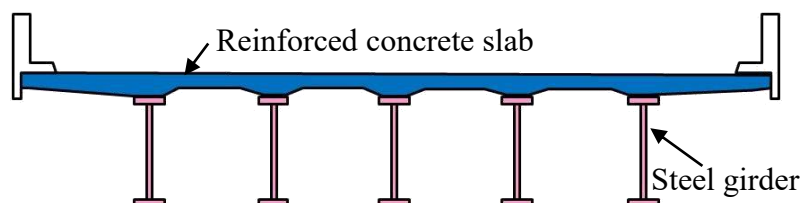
Cross Section of Steel Girder Bridge with RC Floor Slab
